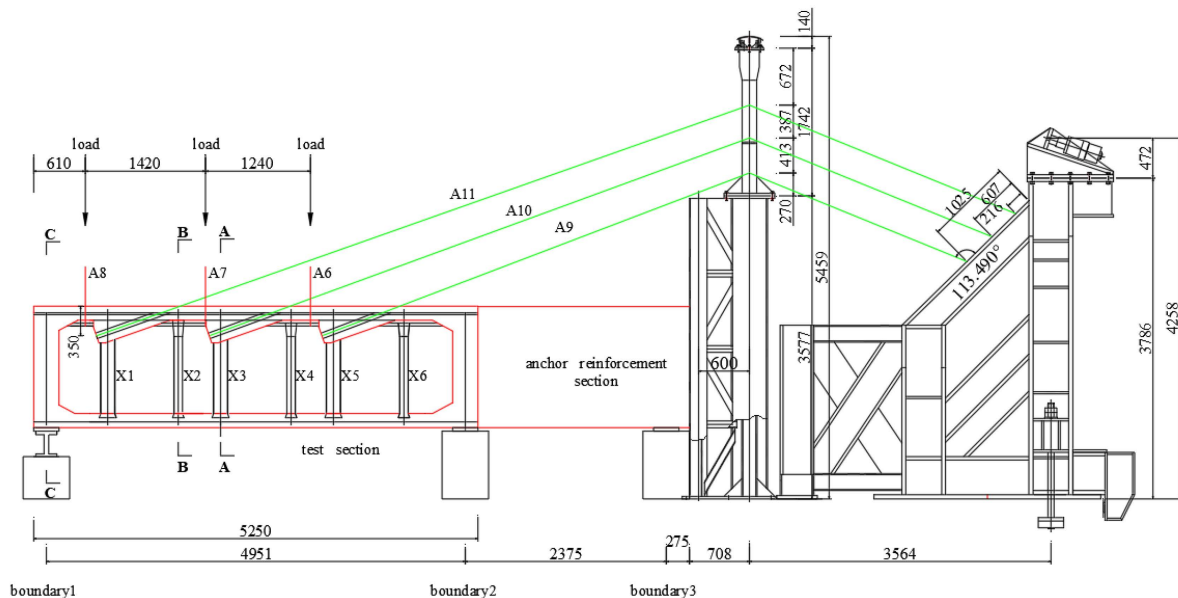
Longitudinal bridge layout of loading points, vertical stay cables, stay cables, and the reaction frame (unit: mm).
